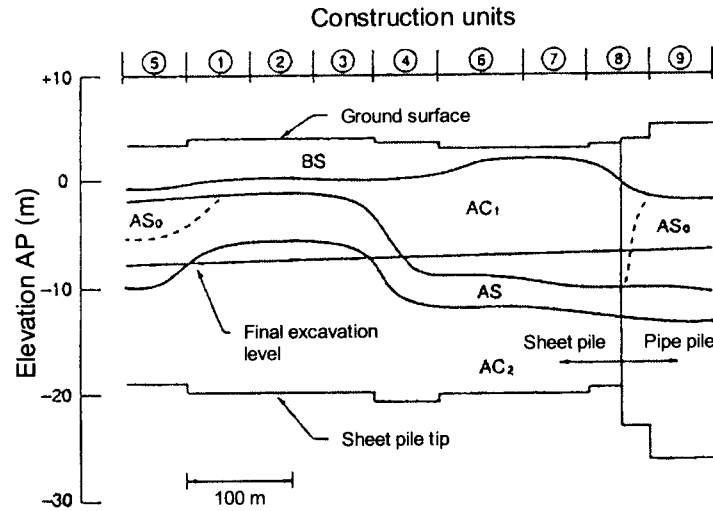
Soil profiles in the longitudinal section and layout of the construction section (Tanaka et al. 1989)
